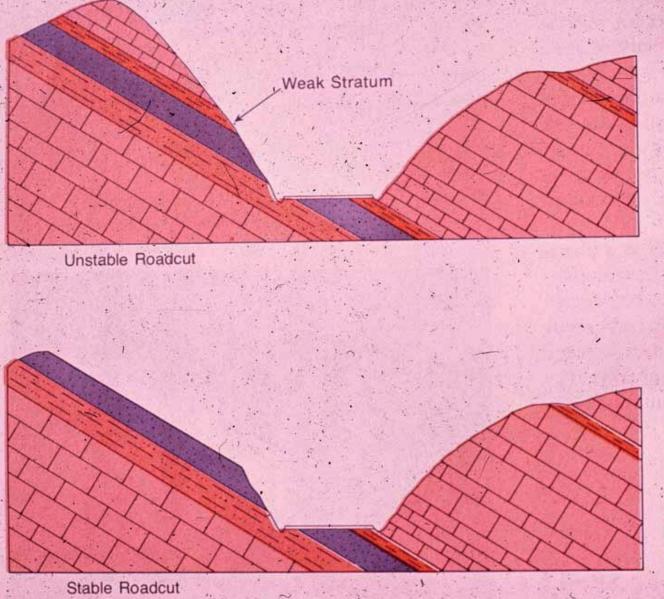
Removal of rock mass above pl potential failure so as to protect way from landslide.
